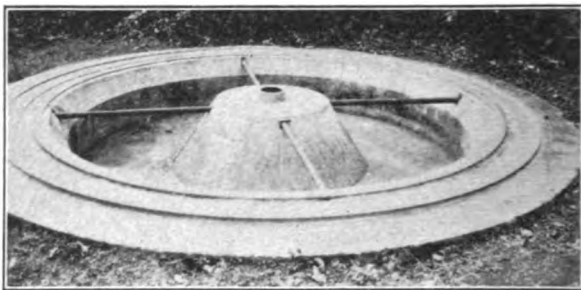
360° emplacement, pintle removed, wheel track support rods in place
